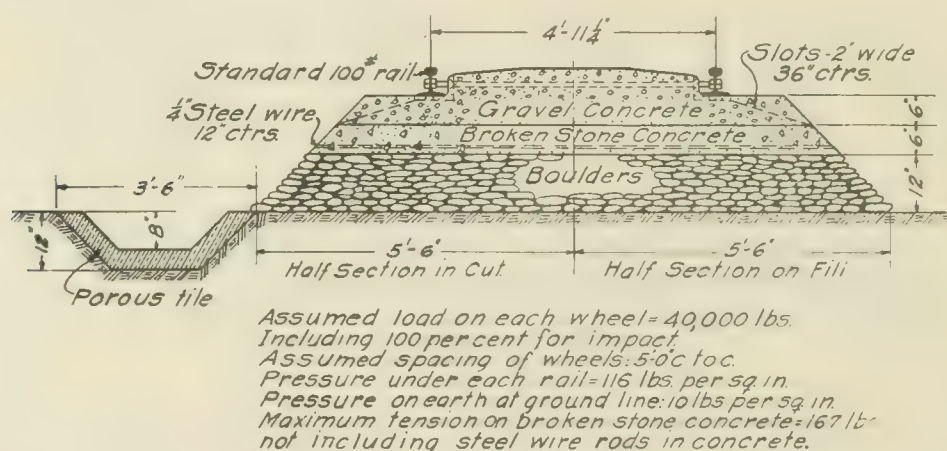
CONCRETE RAILROAD TRACK CONSTRUCTION PROPOSED BY J. W. SCHAUB, 1899.
